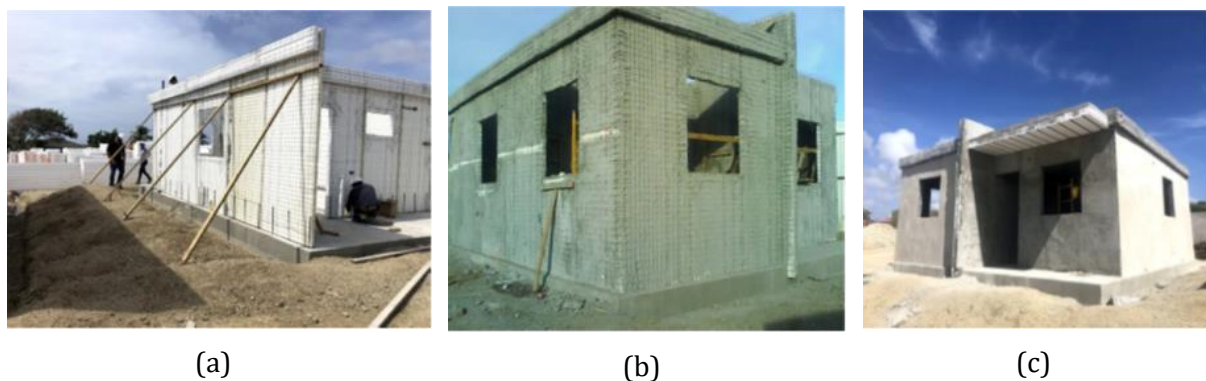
Construction steps of a shotcrete sandwich wall panel: (a) panel setup before applying concrete, (b) panel after the first layer of shotcrete, (c) completed surface [31]
